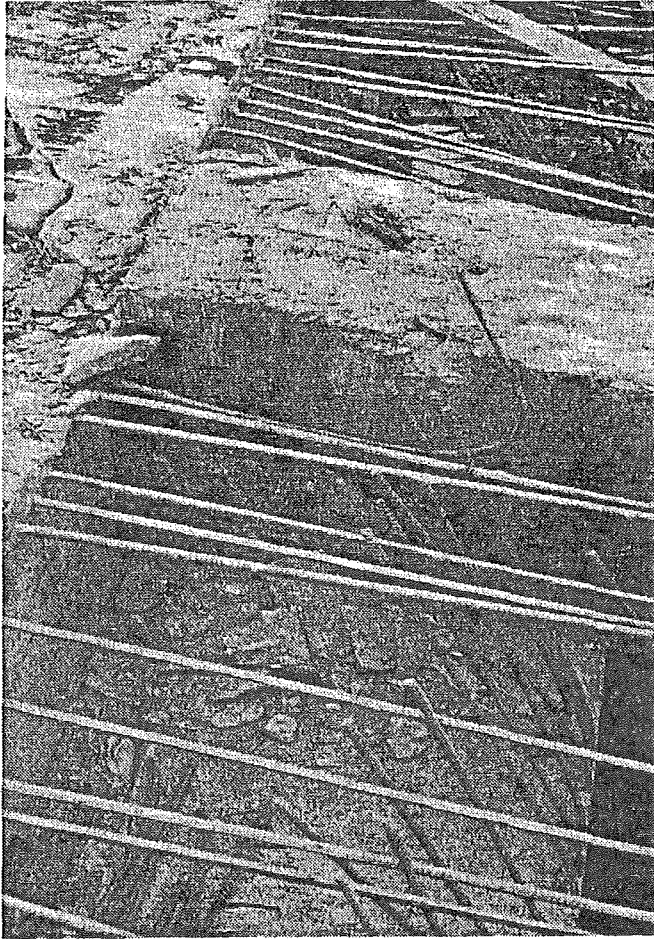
Crushing of spreader beam at top slab expansion joint.
